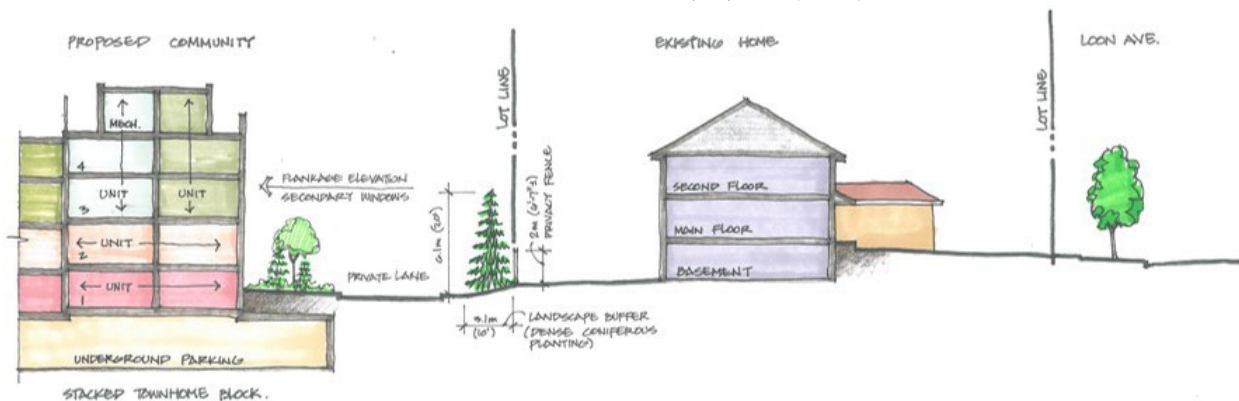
Concept cross section of stacked townhouse units and existing dwellings along Loon Avenue.
